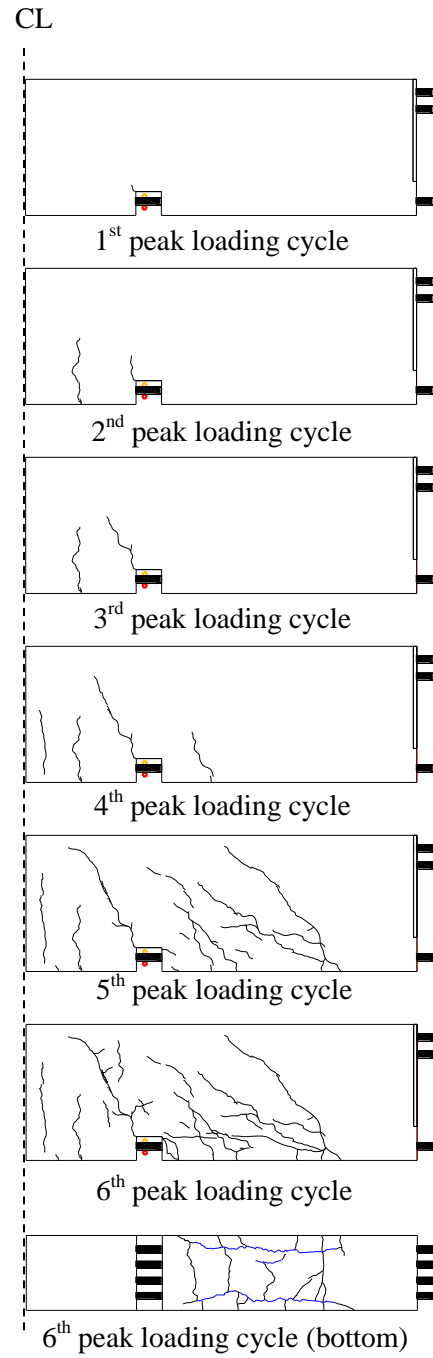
Loading Crack Pattern of Specimen No.5 and No.6
